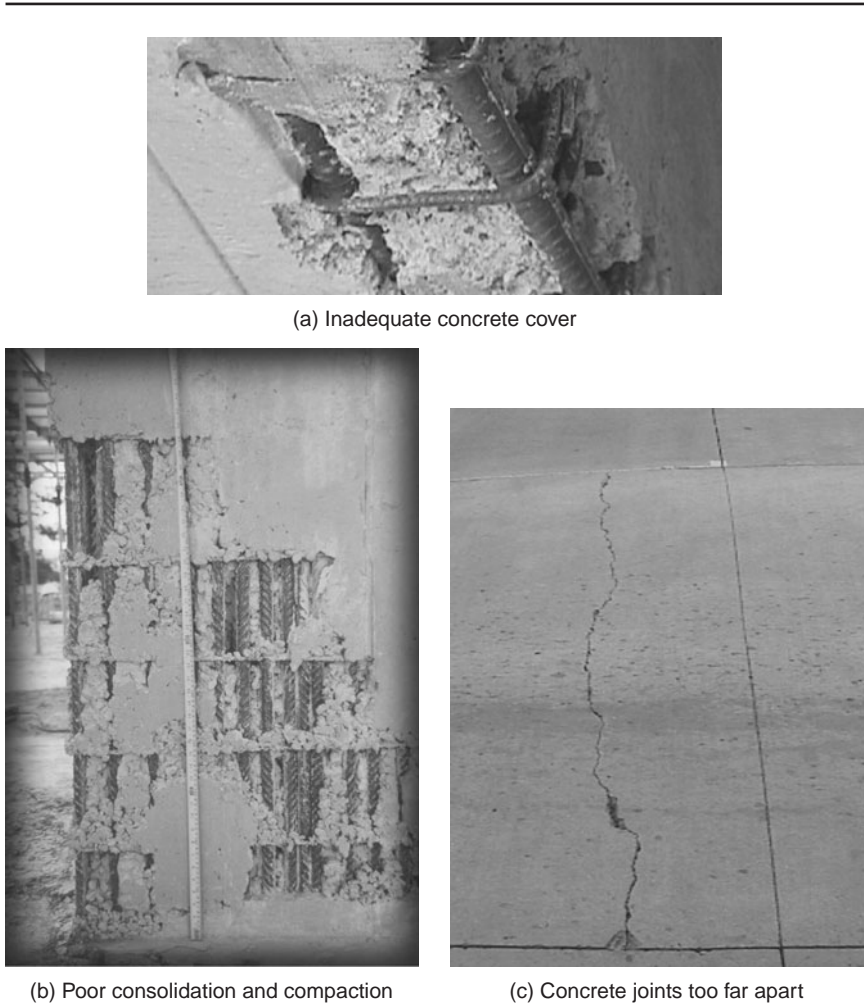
Typical concrete damage caused by improper construction practice. [Photos courtesy from Carlos Videla (*a* and *c*) and Paulo Barbosa (*b*)]
